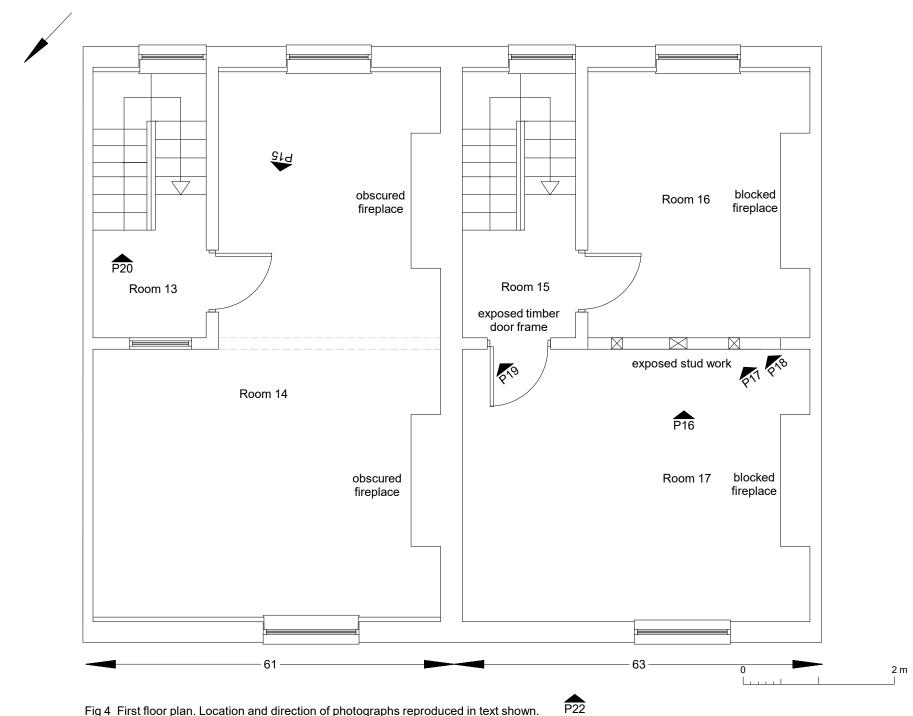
First floor plan. Location and direction of photographs reproduced in text shown.
